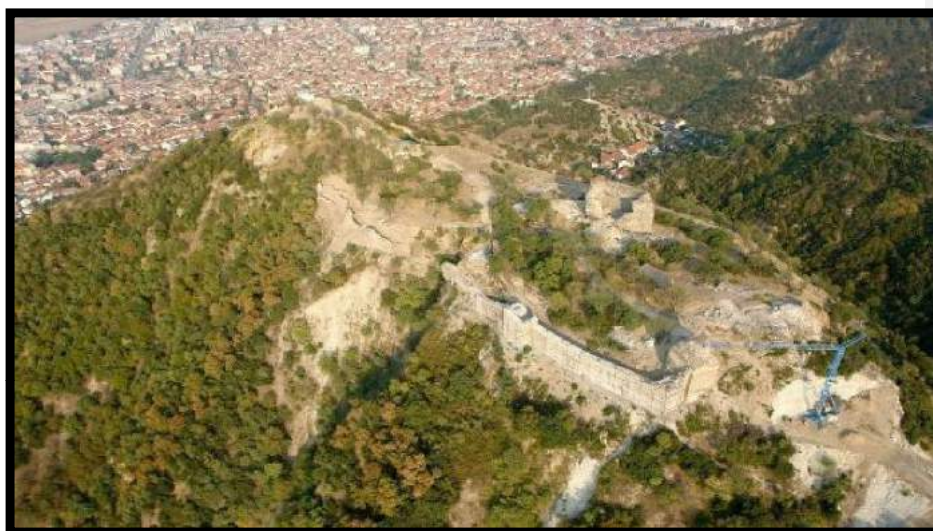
View of the south-west archaeological site of “Tsar’s Towers”, place where the construction works will be executed
